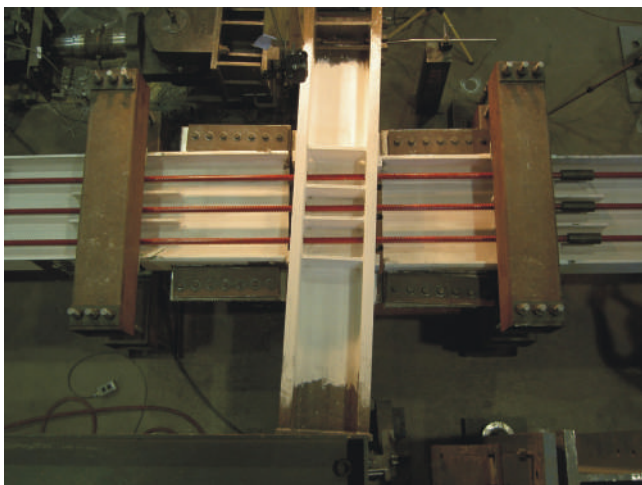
Undamaged post-tensioned moment-resisting frame at 4% drift (photograph courtesy of Professor C. Christopoulos).
